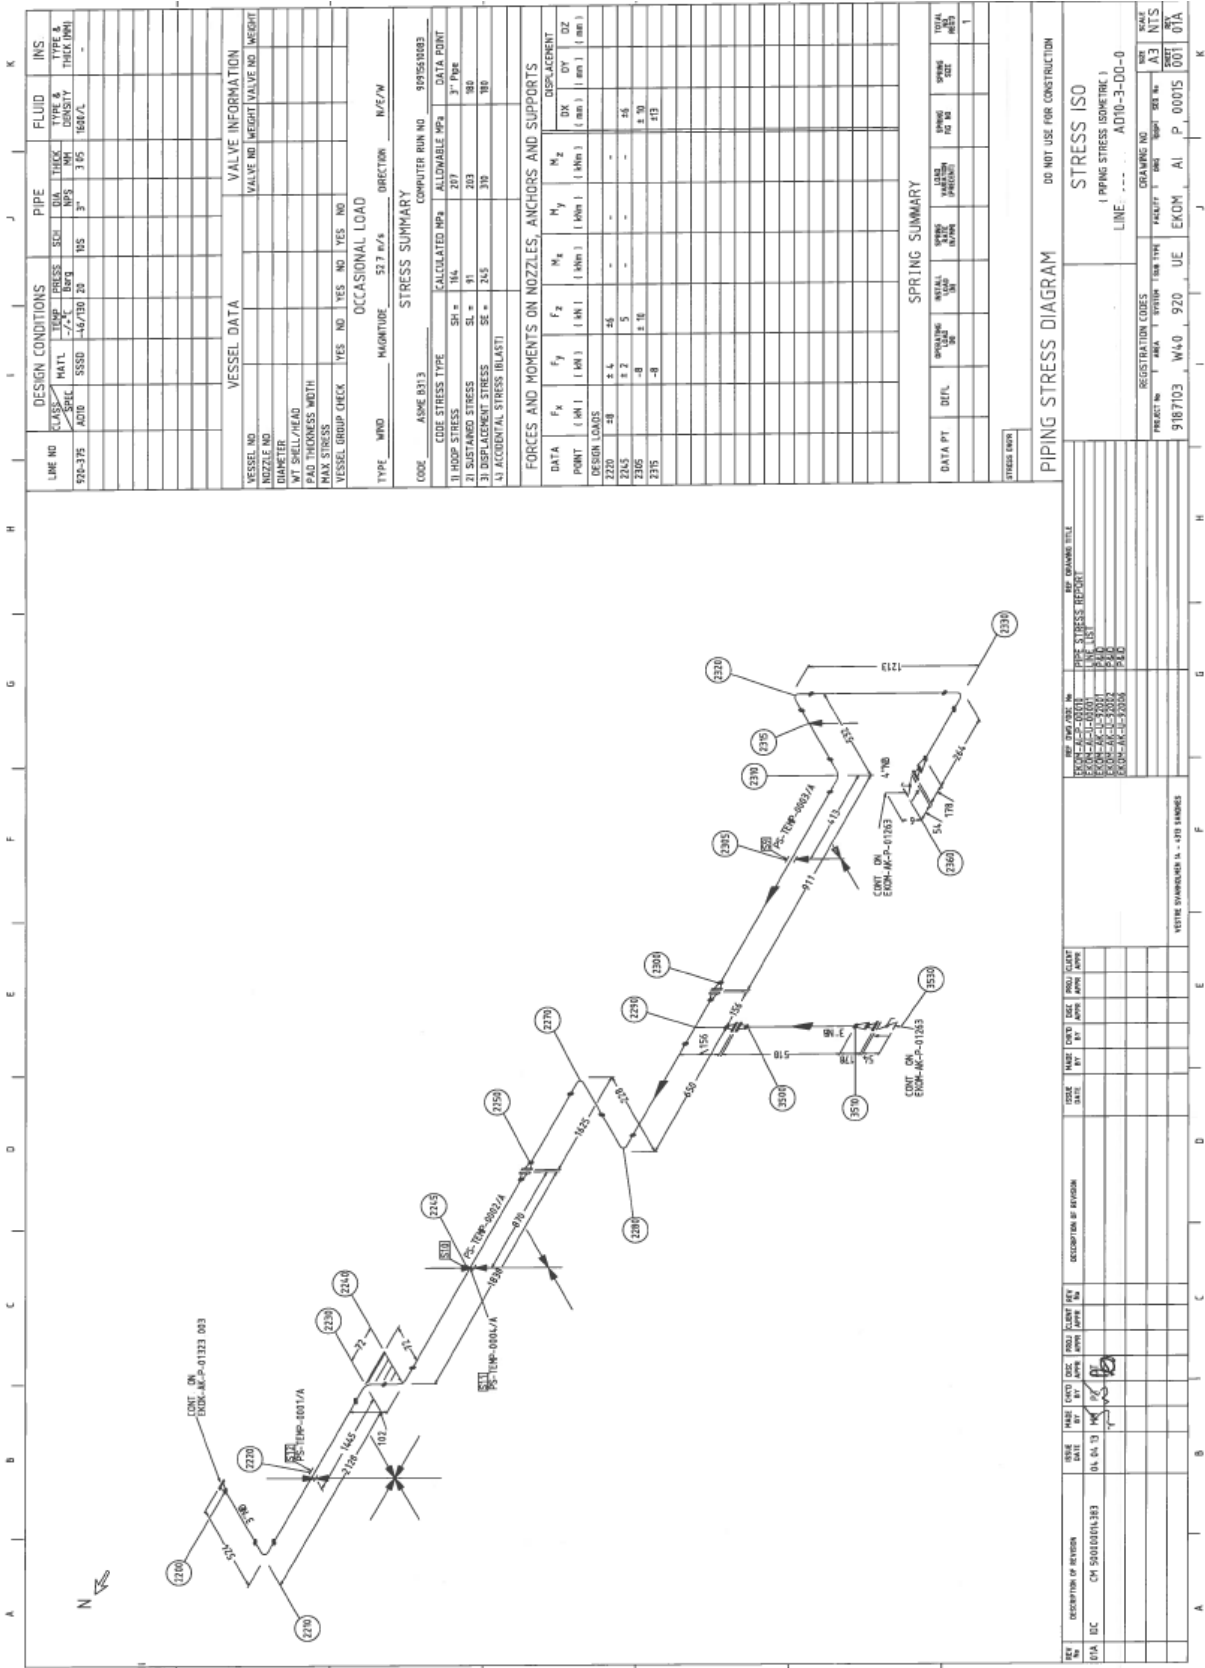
Pipe stress isometric drawing of the Slurry system in Mud Handling system
